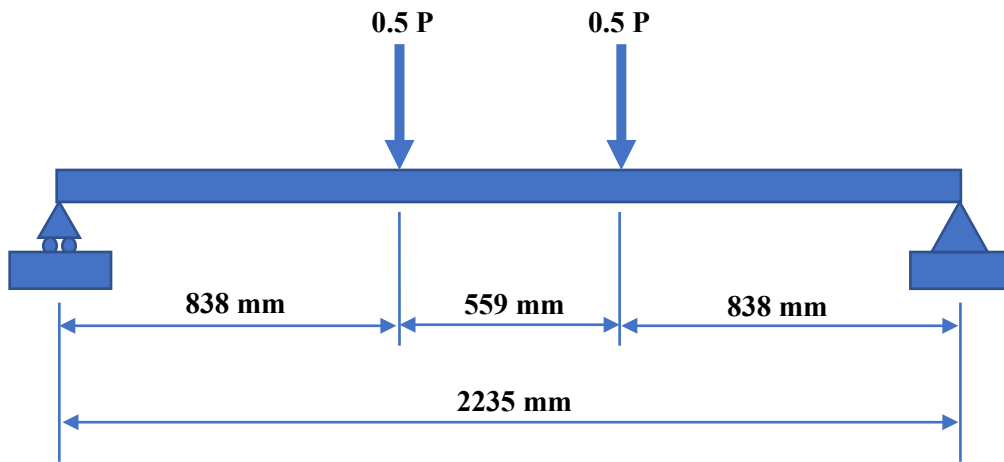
Four-point bending test configuration and dimensions of a simply supported beam.
